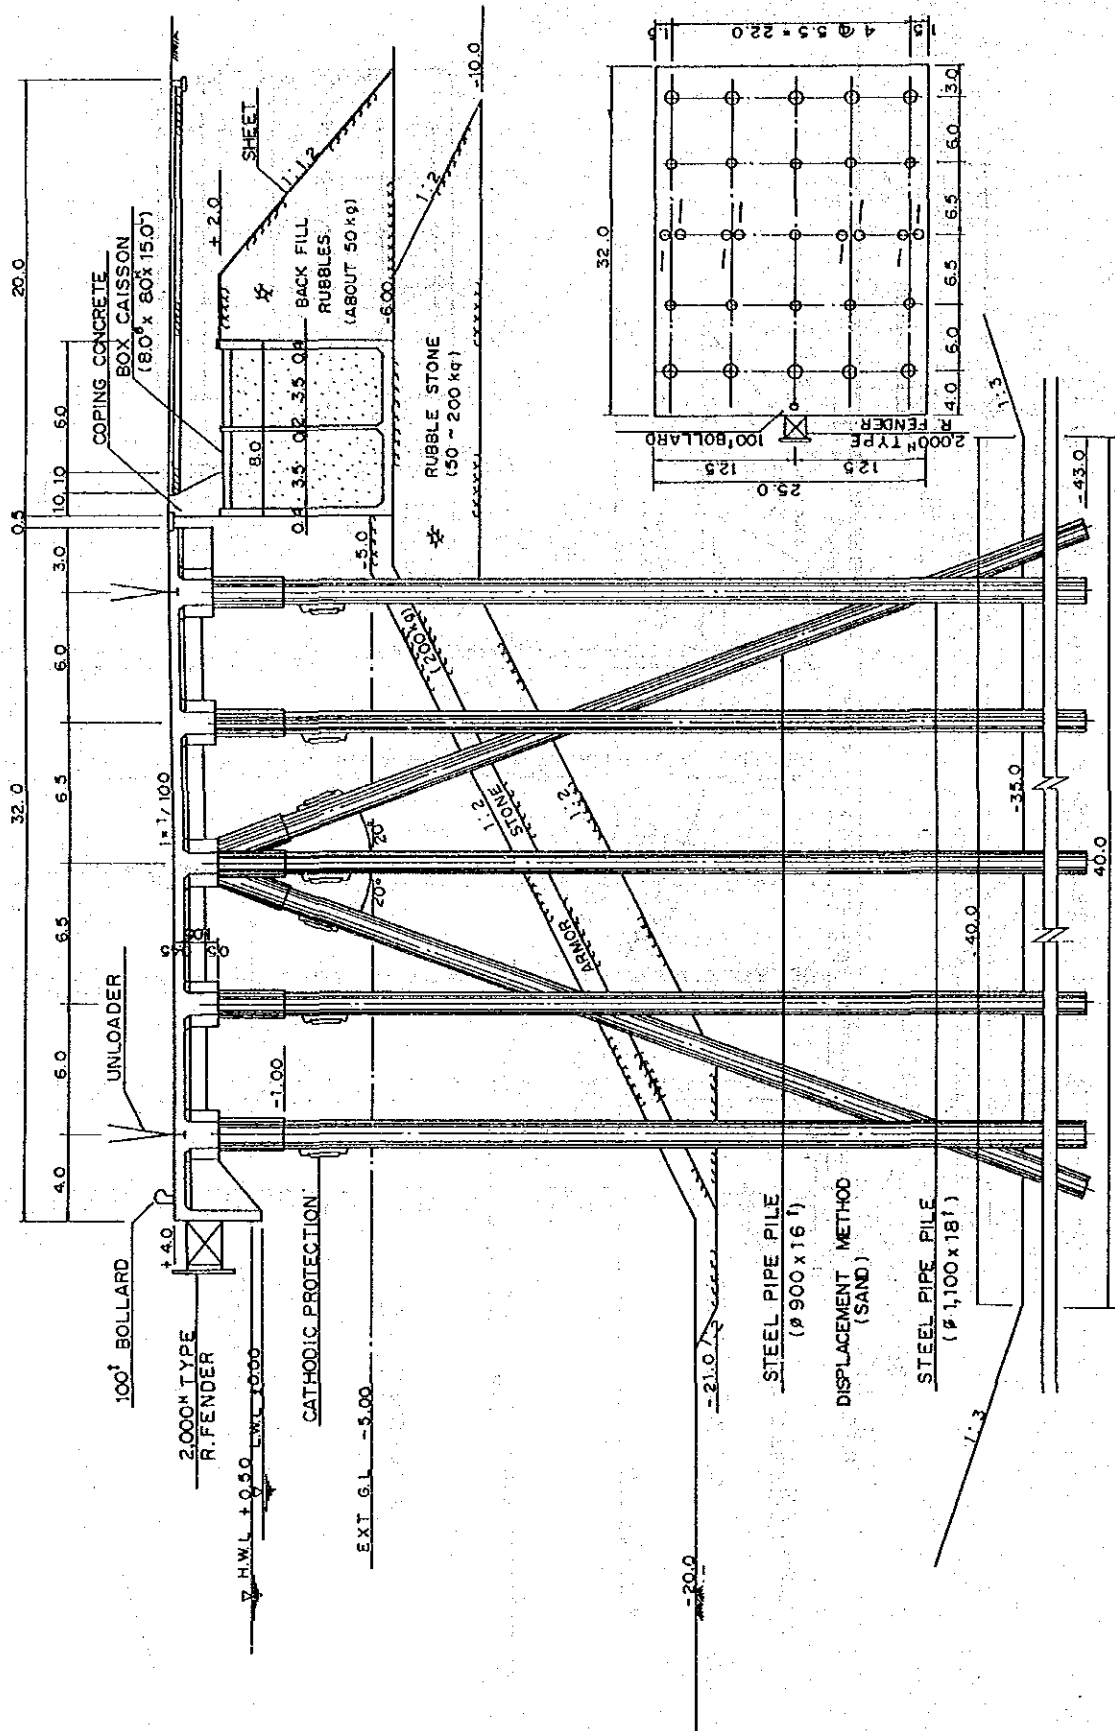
(A-h) ⑥ -1 CONTAINER BERTH (-12.0) (PLAN A AND B) (Unit; m)
